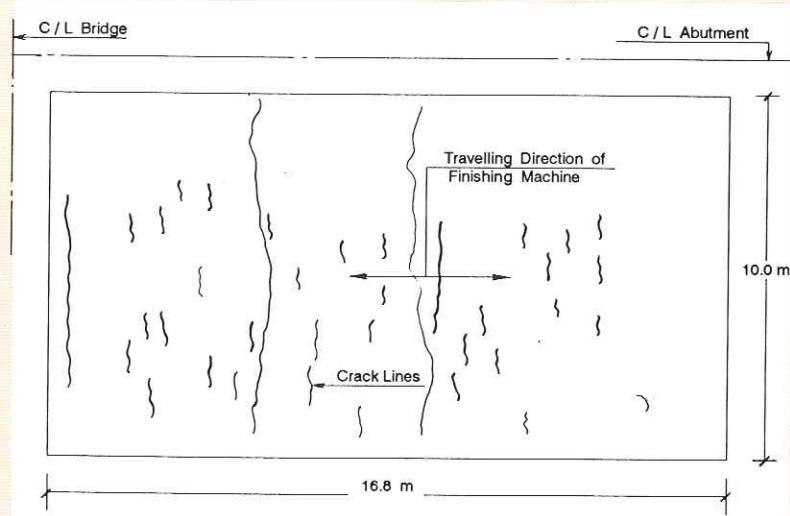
APPROACH SLAB AT STRUCTURE 13 - 2 ( NORTH )
